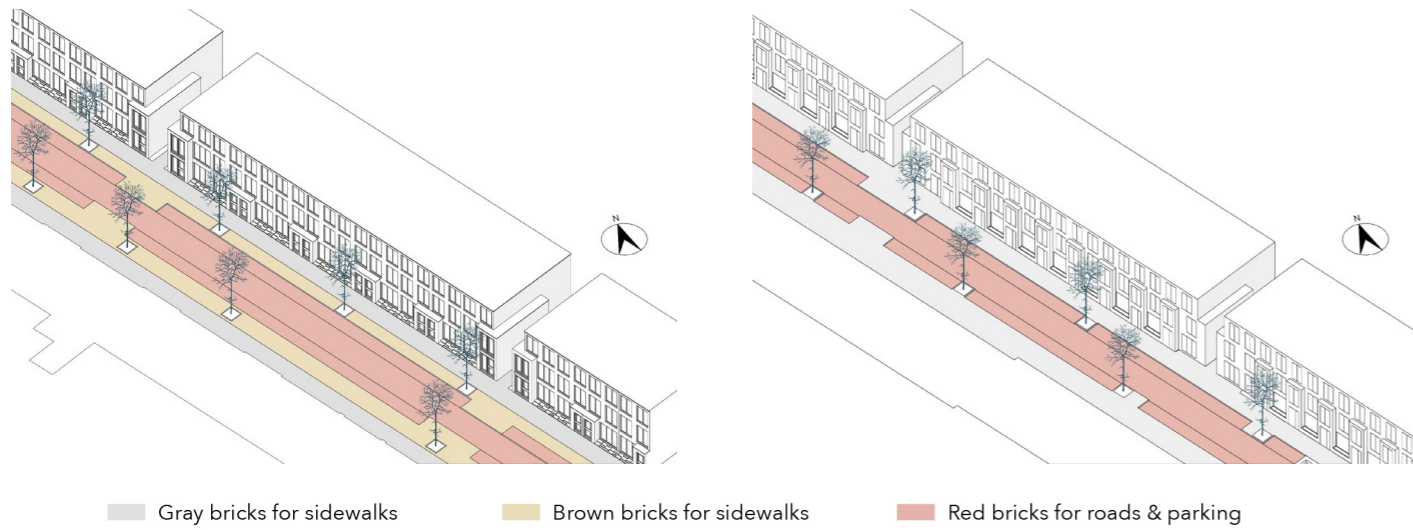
Illustration of different functions and pavements within street canyons for wide street and narrow street.
